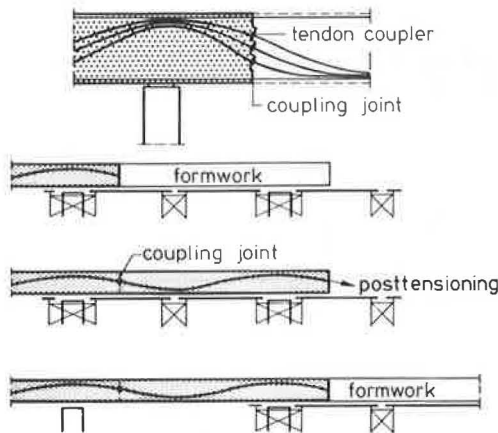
Sectional construction of continuous posttensioned concrete bridges.
